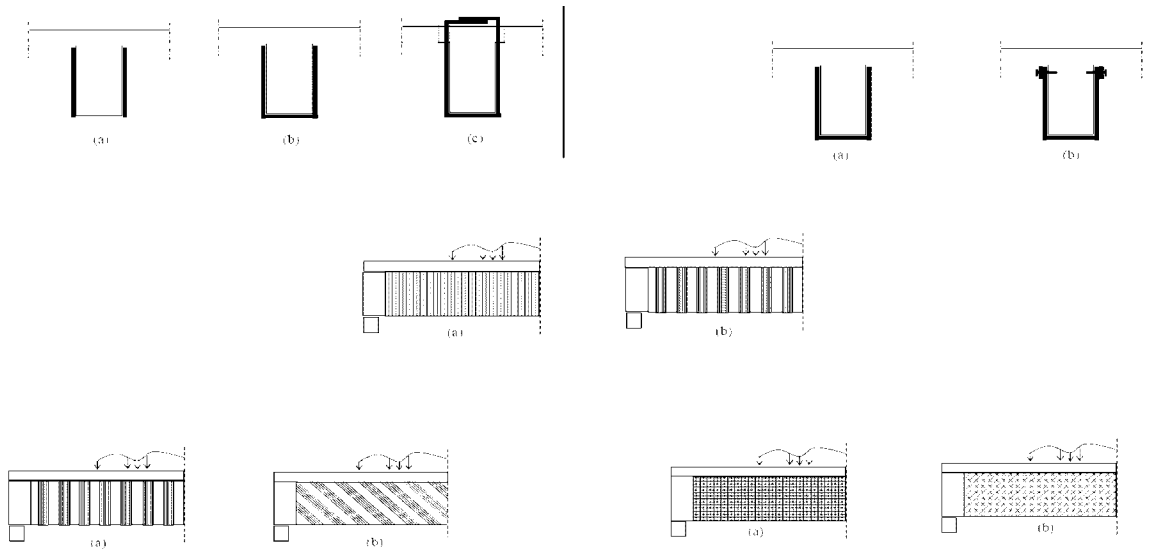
Different FRP shear strengthening configuration, anchorage system and orientation angle
